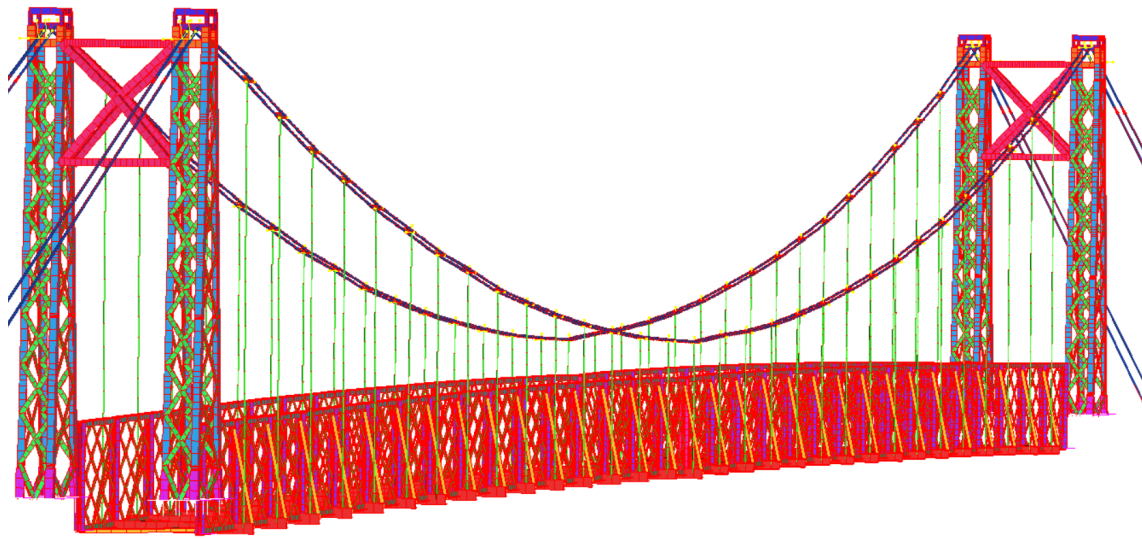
Detailed finite element model of Daly's Bridge. Source: Author
